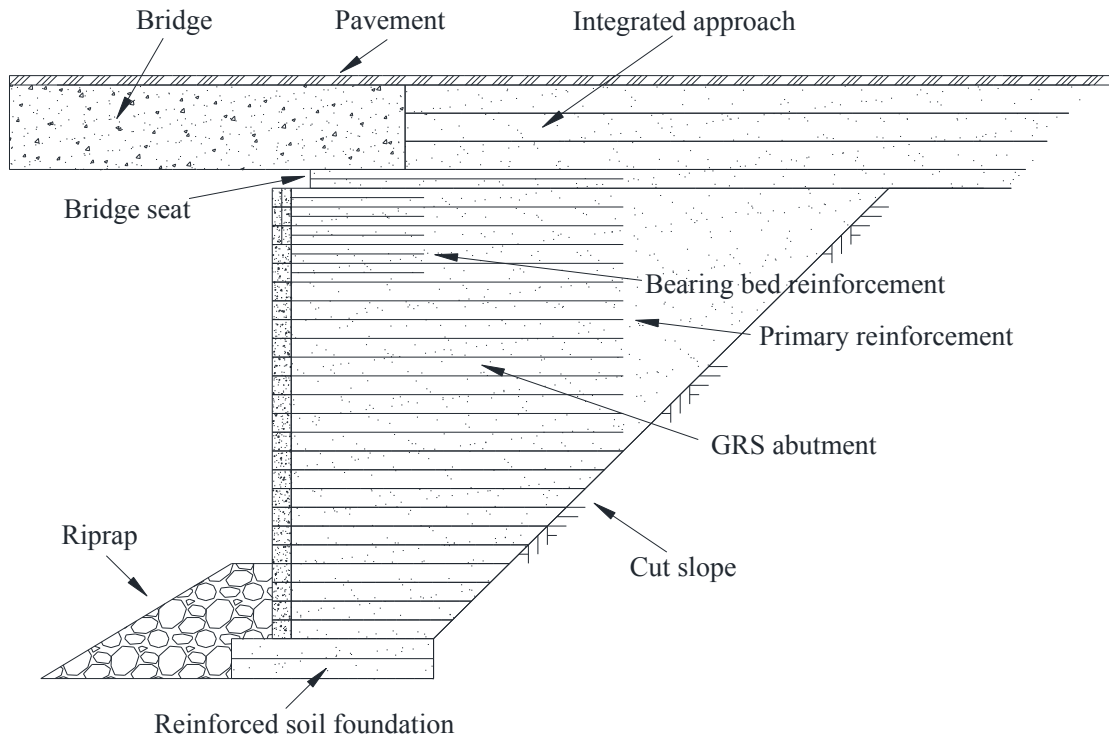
Typical cross-section of bridge abutment for GRS-IBS (adapted from Adams et al. 2011b).
